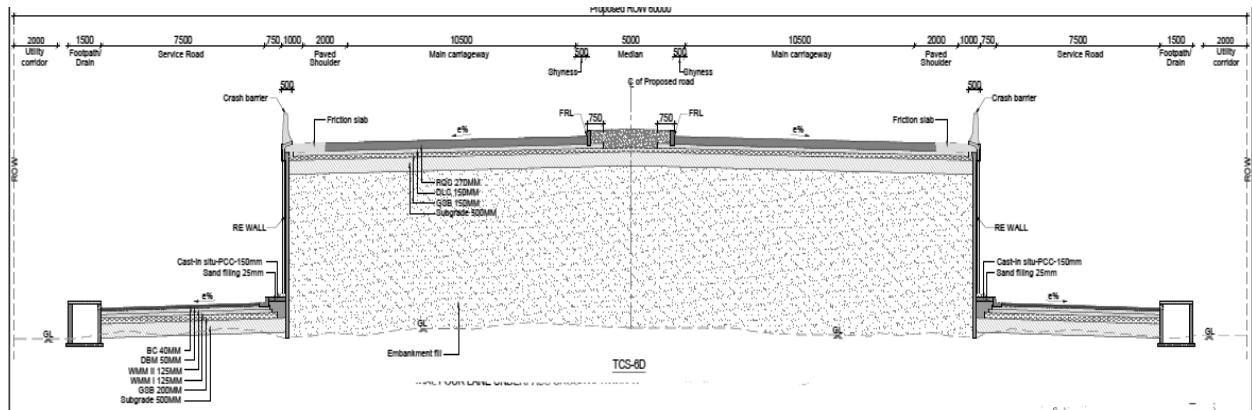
TCS-6D Typical Four Lane Underpass Cross Section with Service Roads in Bypass & Realignment
